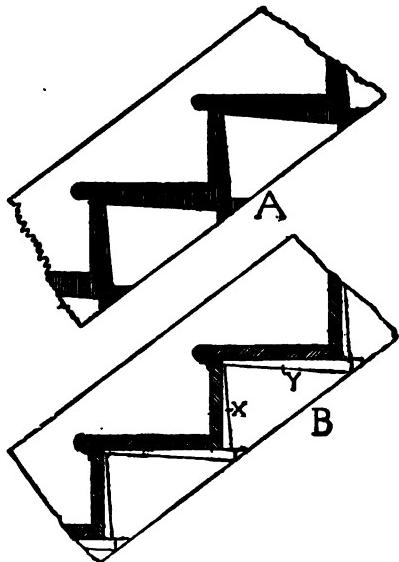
Connection of "Wall String" to Treads and Risers in "English Method" of Stair-Construction.
